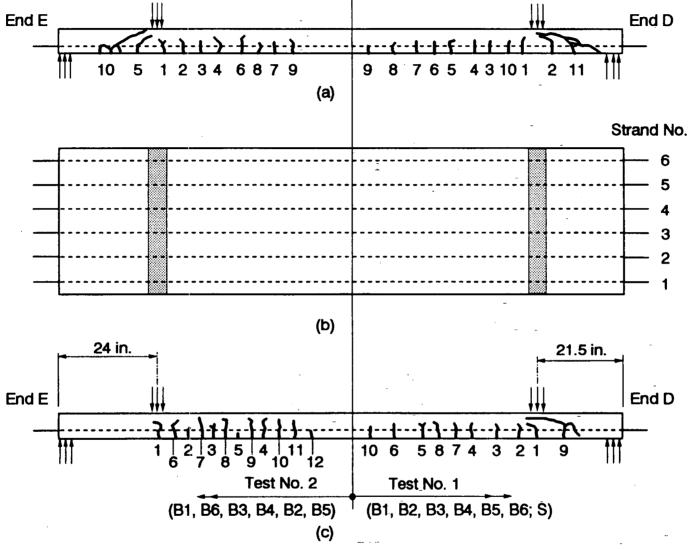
Crack patterns for D-type Specimen No. 8-6.0DC-3:
